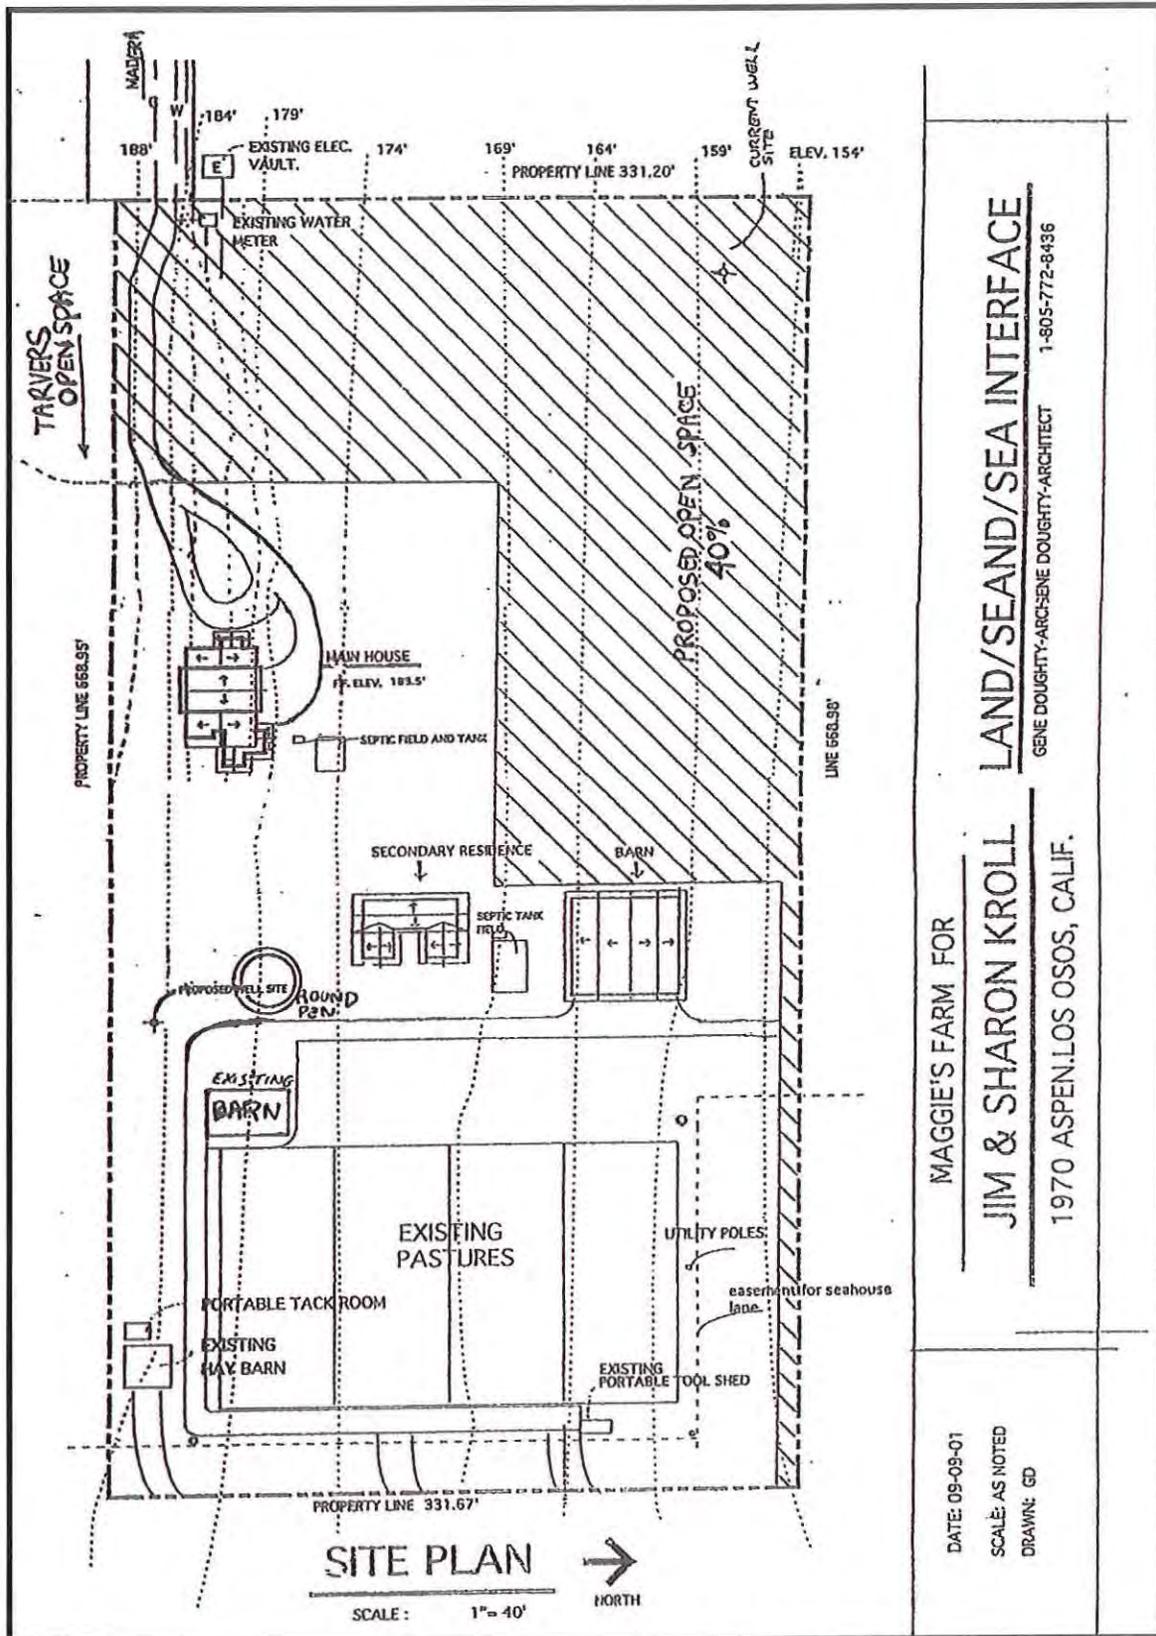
Proposed site plan for Kroll project (Source Jeff Edwards, 2007).
